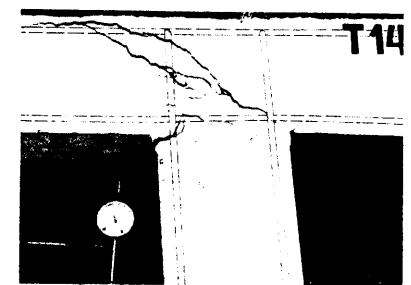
Specimen T14 after Diagonal Tension Crack Failure
